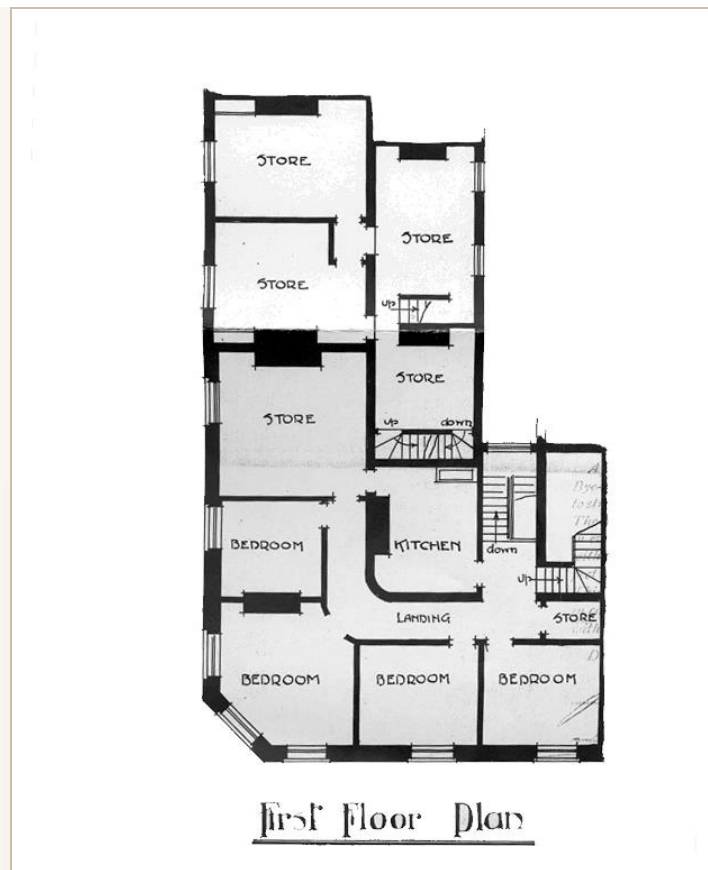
1911 architectural drawing, The George & Dragon, existing first floor
